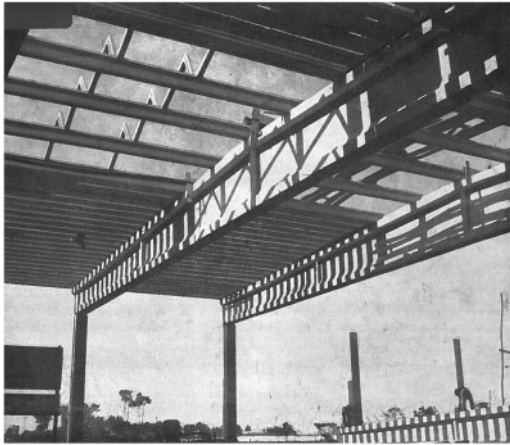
The Cotton warehouse in construction, with the prestored beams and the hollow slabs (Rêgo 1951a).
